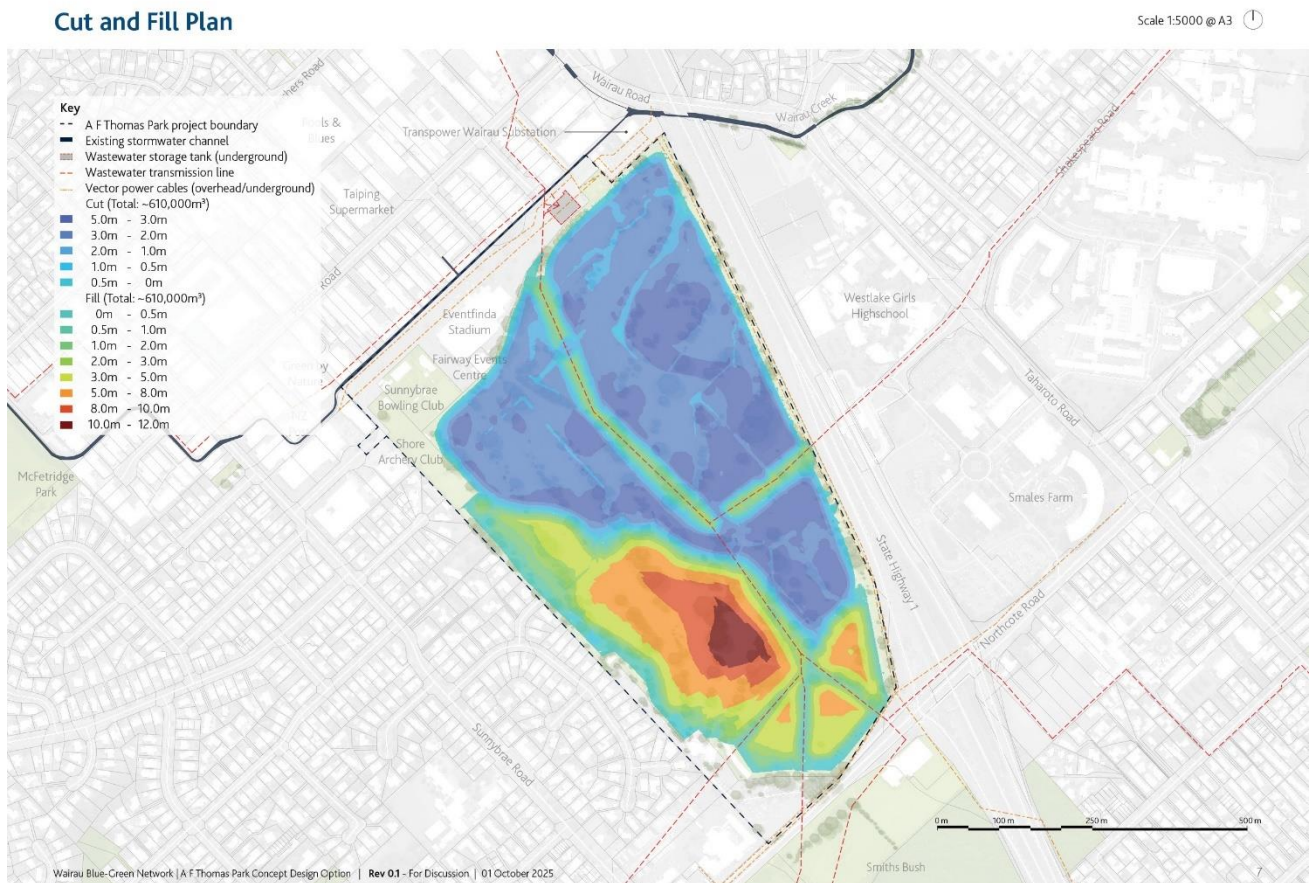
Proposed cut and fill plan for A F Thomas Park Concept Design
